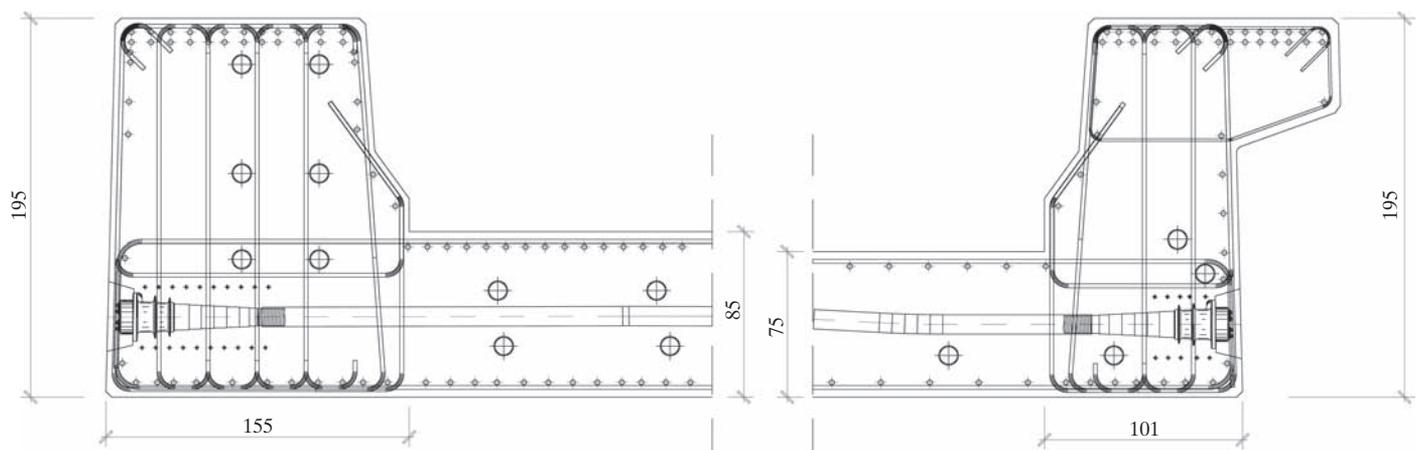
Detail of cross section (slab and edge beam) near the obtuse (left) and acute angles (right)
